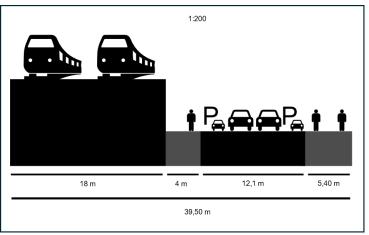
Street space allocation Spandauer Straße West (Tram). Author (2024)
